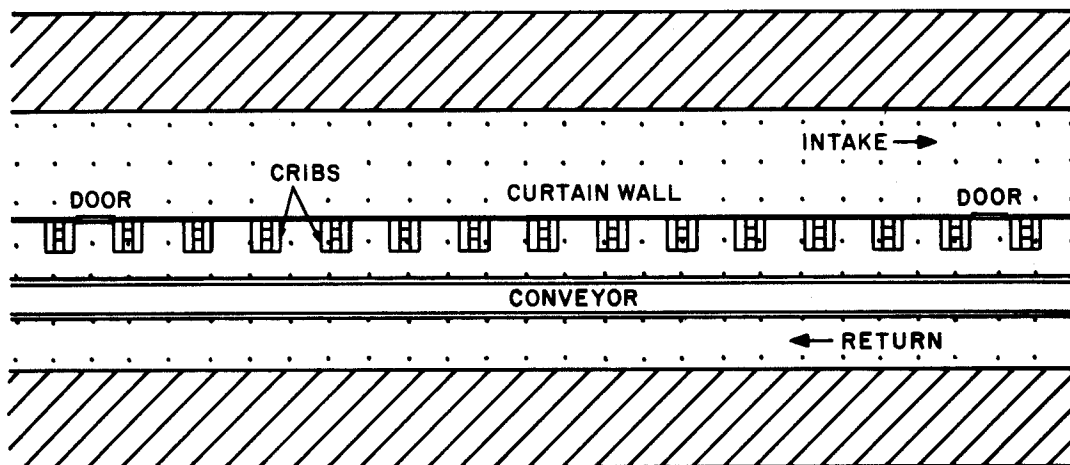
PLAN VIEW OF THE SINGLE ENTRY LONGWALL DEVELOPMENT,
